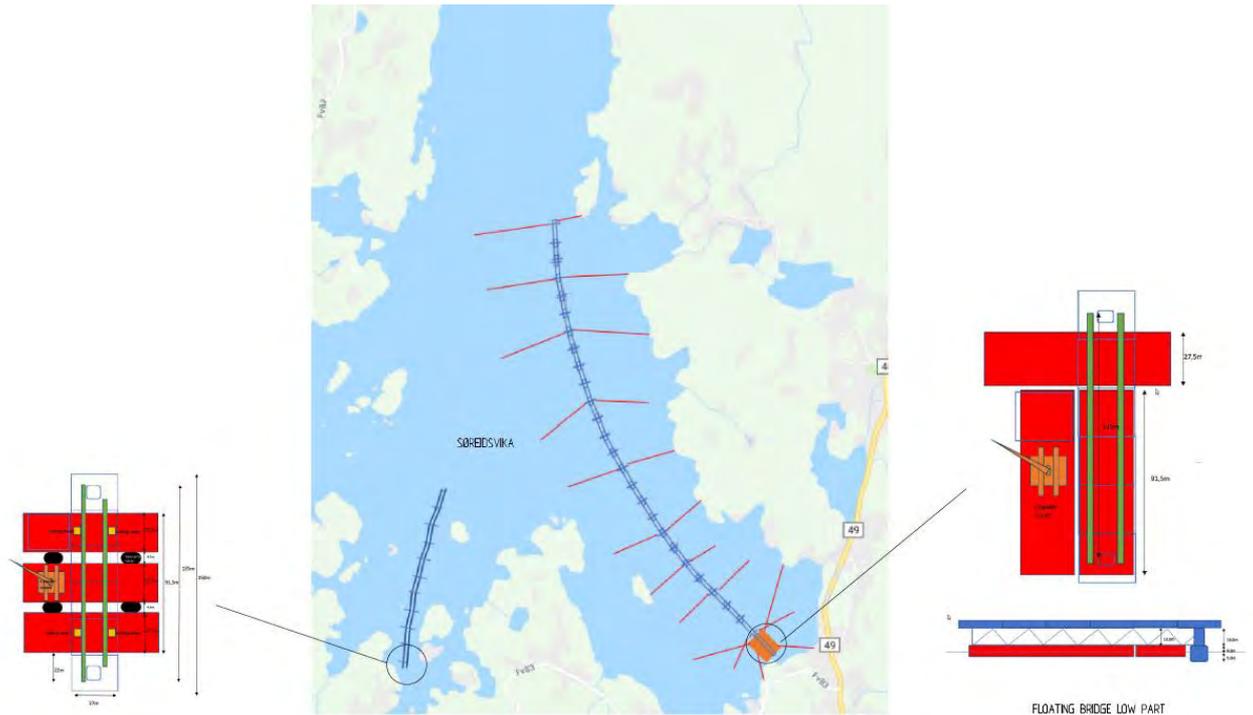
Low bridge and high bridge assembly site set up location in Søreidsvika
